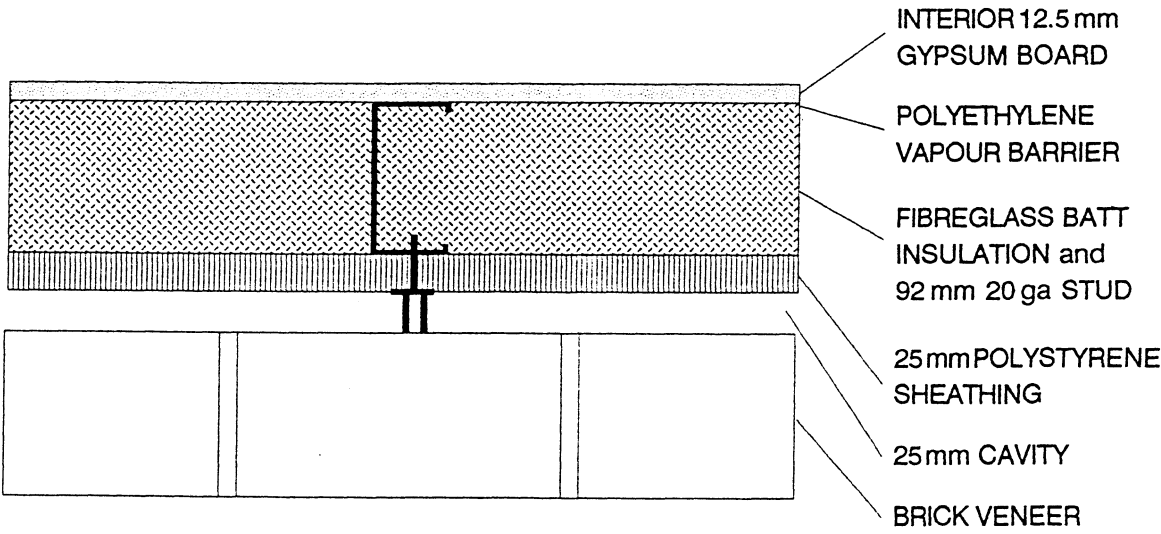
Horizontal Section Showing Components of Wall Type 2
